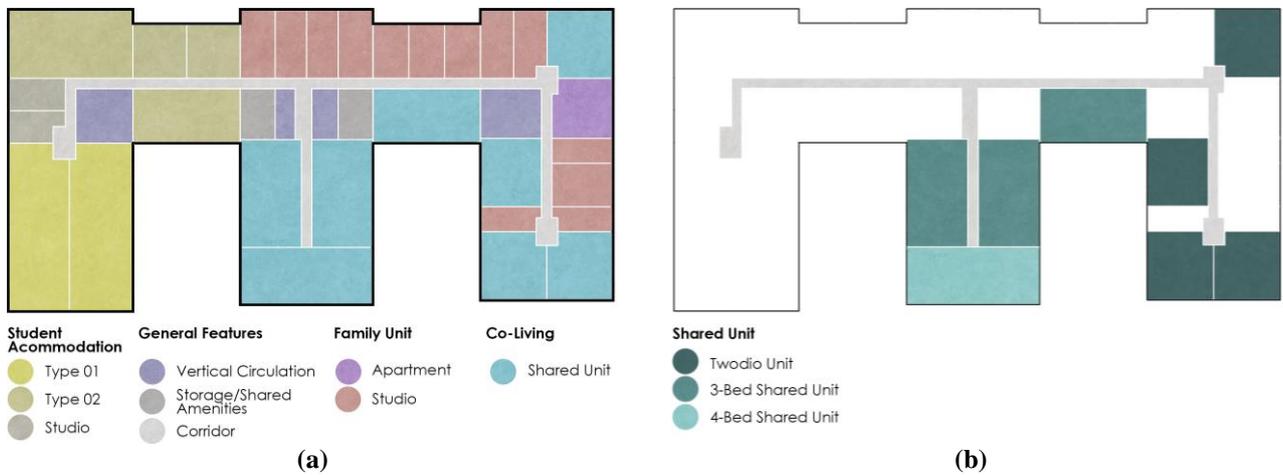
(a) Typical floor plan. The drawing is not to scale (source: Author's diagram based on data from Manchester City Council, 2018); (b) shared unit on a single floor plan (source: Author's diagram based on data from Manchester City Council, 2018)
